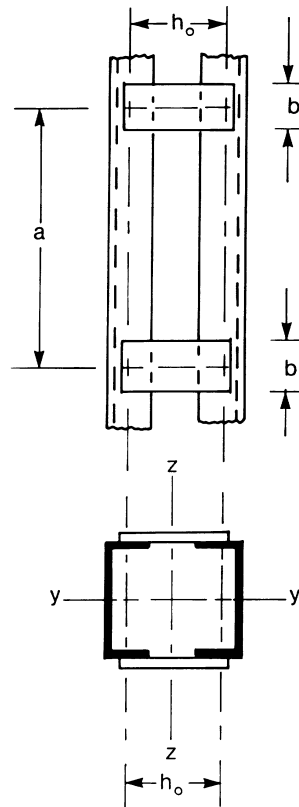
Part of a typical battened column and its built-up cross-section [2-24]
